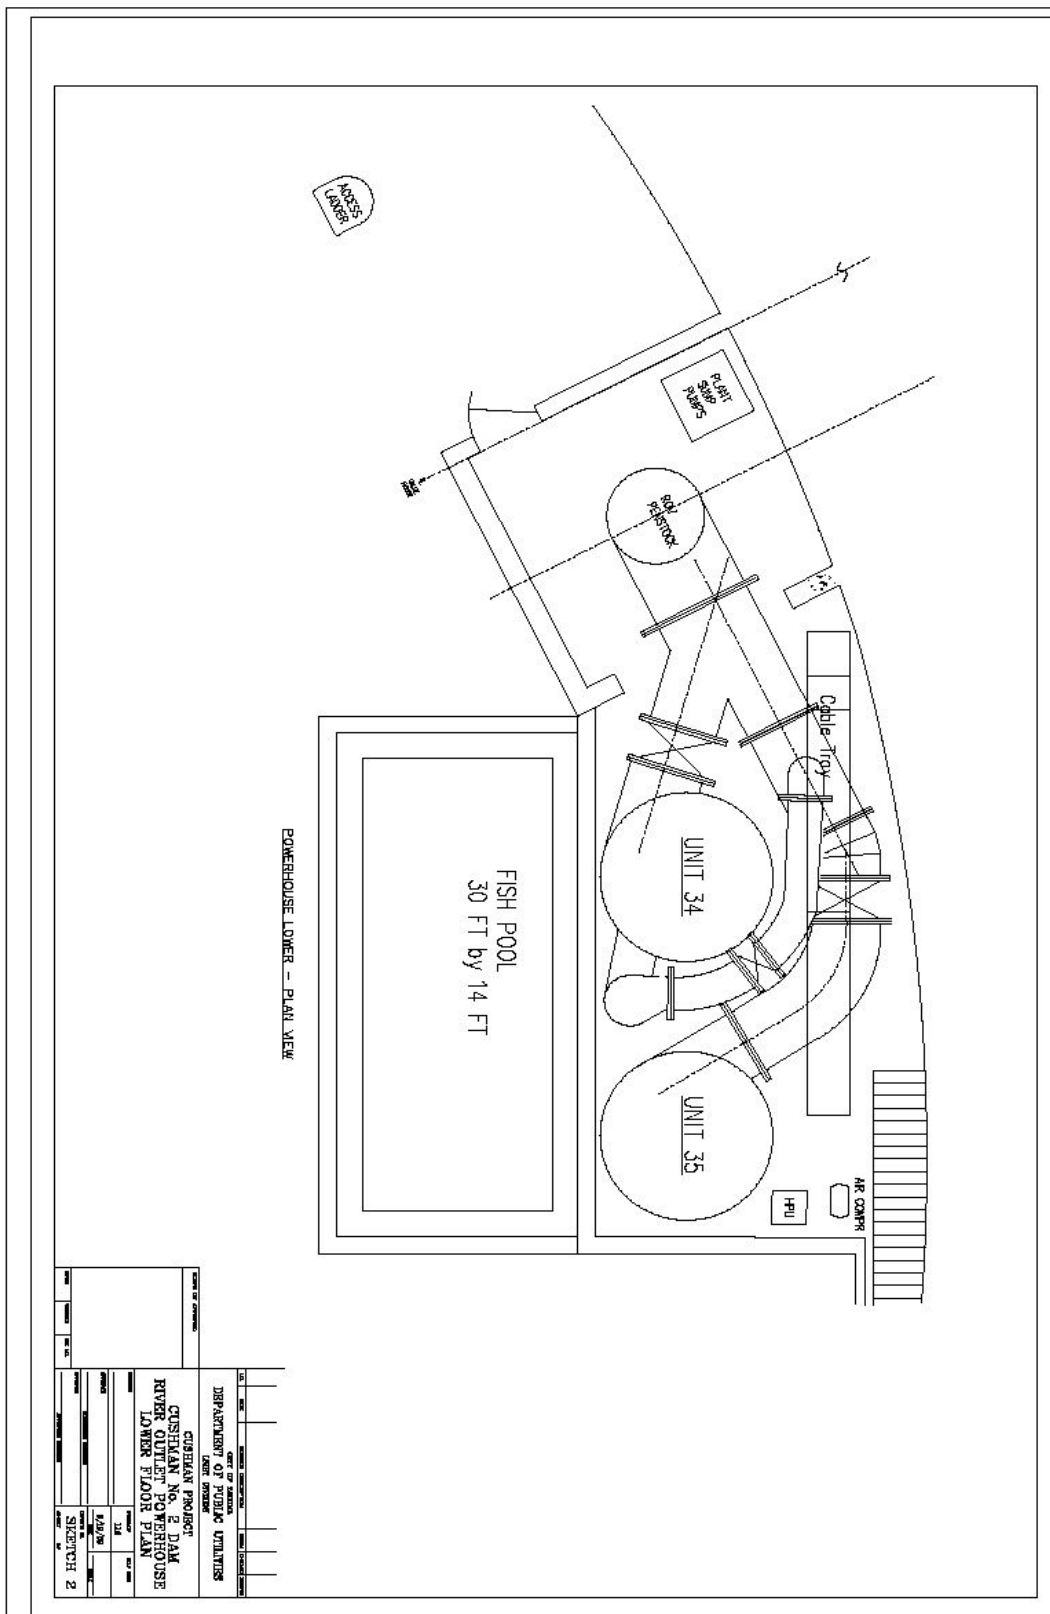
Proposed North Fork Skokomish Powerhouse Lower Floor Plan
